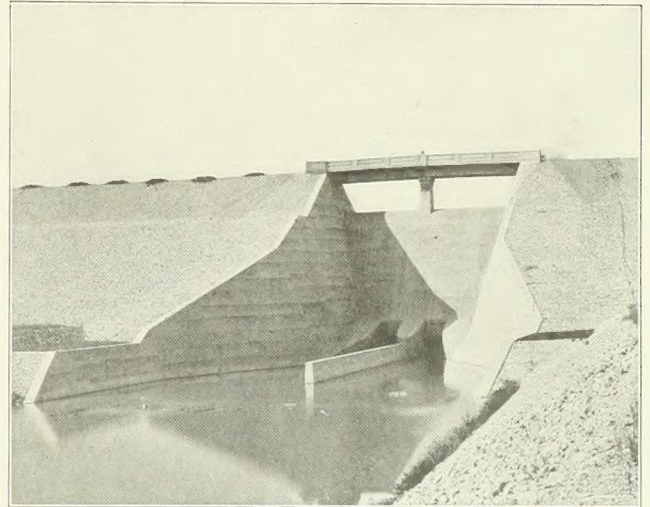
THE COMPLETED OUTLET STRUCTURE SEPTEMBER 28, 1921.
